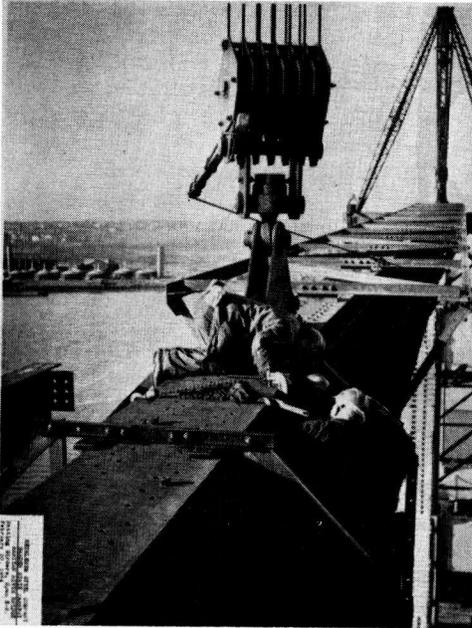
Close-up of girder of Figure 12, showing truss and braces for supporting it vertically.
